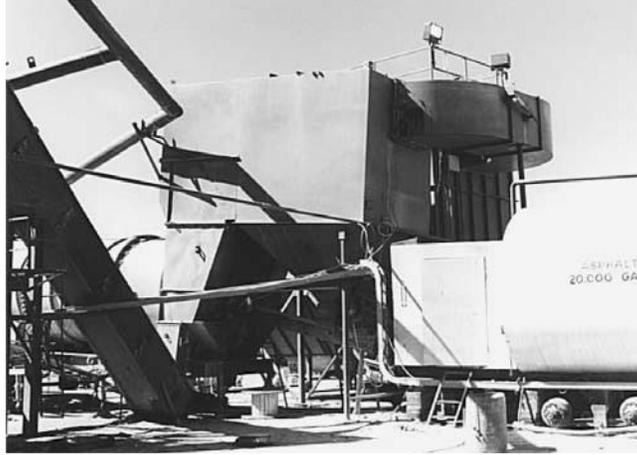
Lockwood hot-mix plant—baghouse fines return system.
